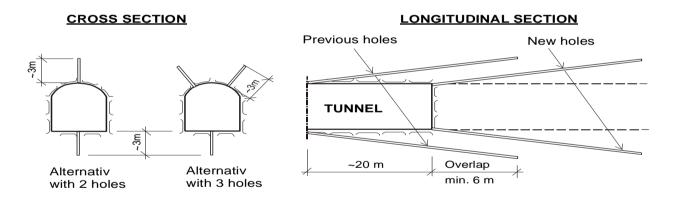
Principle sketch of probe drilling and pre-grouting ahead of the tunnel face.
